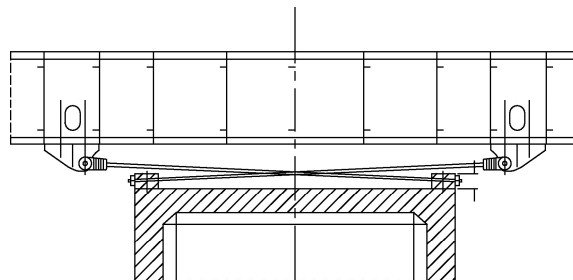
Elevation of the temporary structure for fixing the girder and tower in the vertical direction in the sutong yangtze river highway bridge
